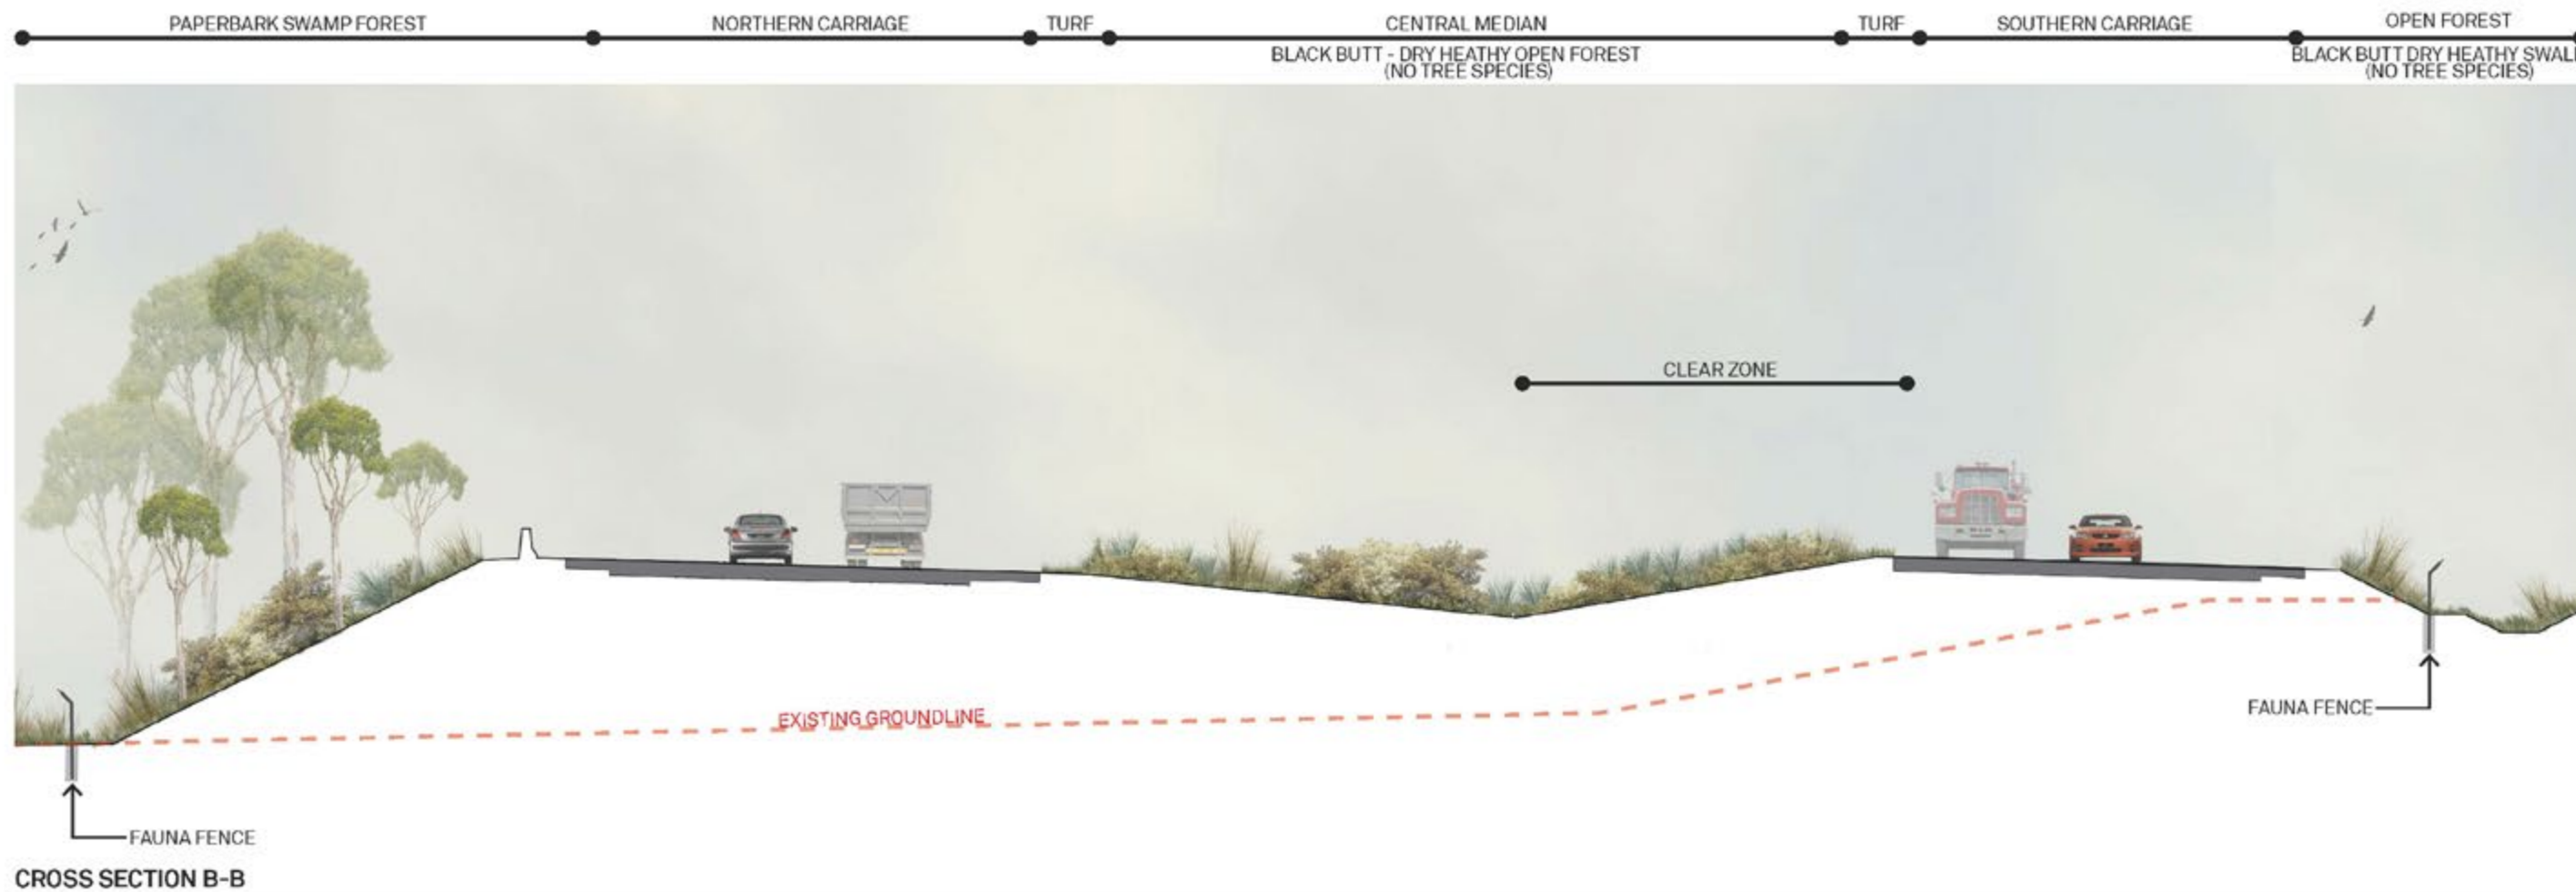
Urban and Landscape Design Cross Sections – Trustrums Hill to Broadwater National Park
